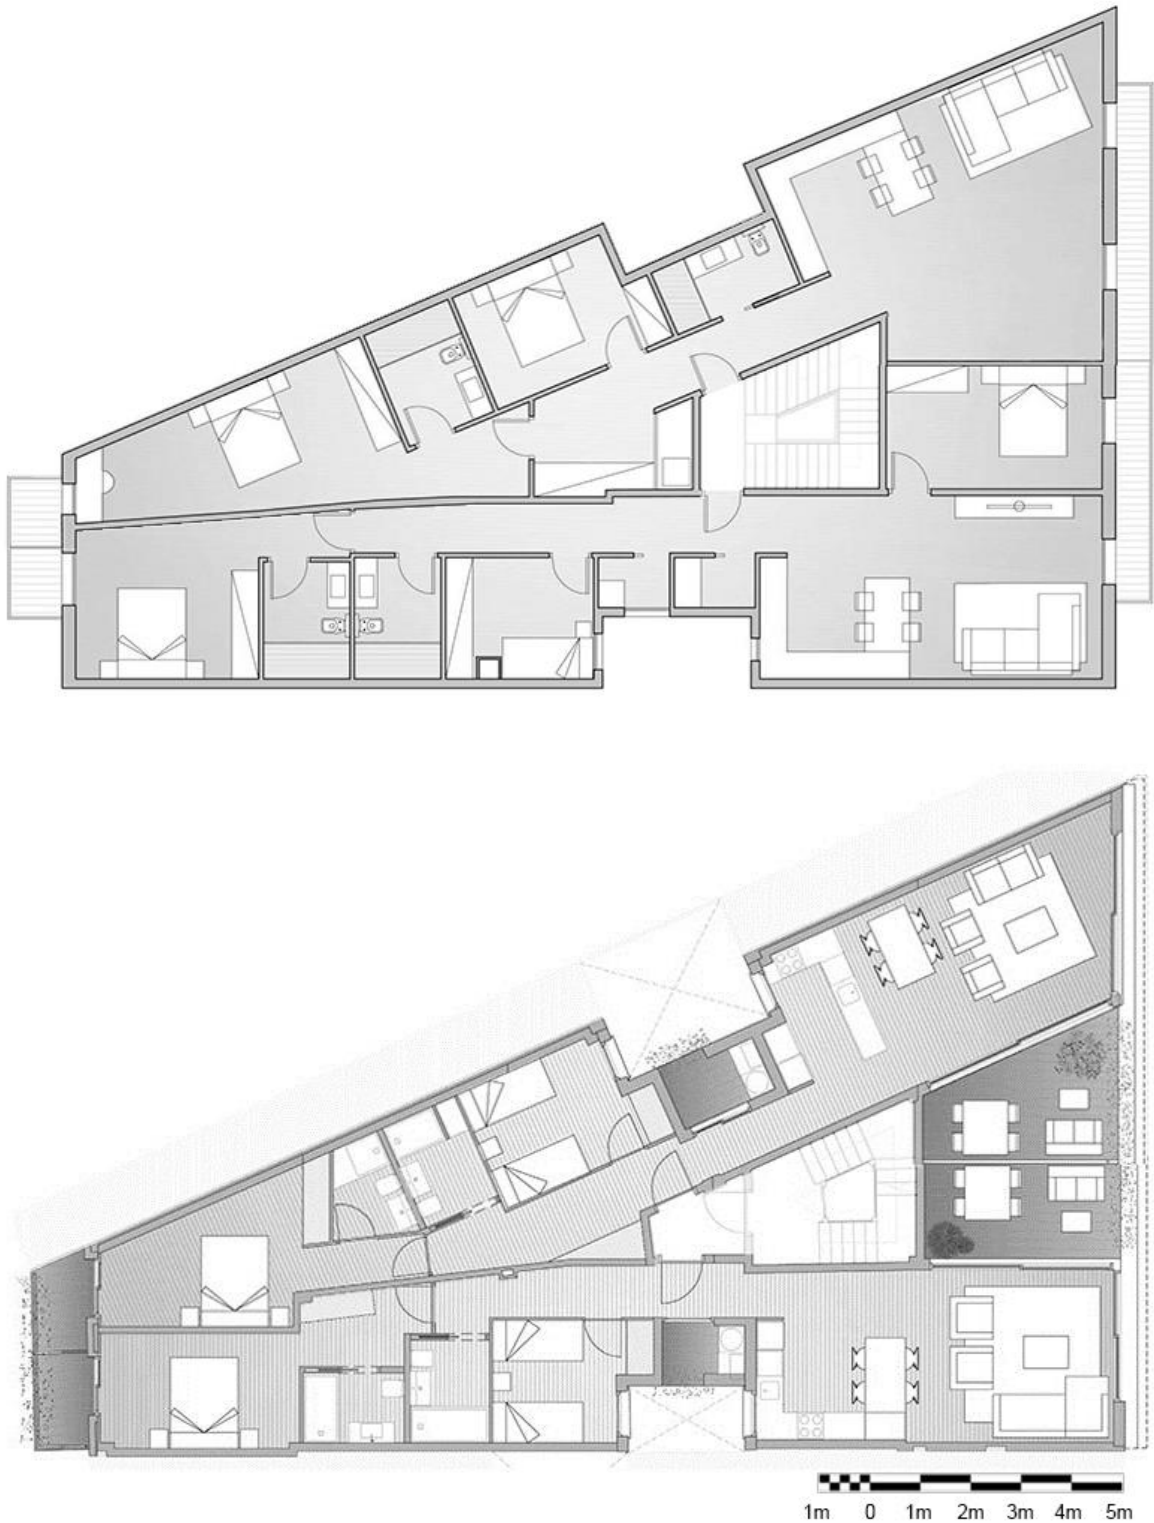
Top: Floor plan of the existent refurbished fifth floor. Bottom: Floor plan of the added expansion Source: Casa Ático Website (Dossier Letamendi 29, 2015)
